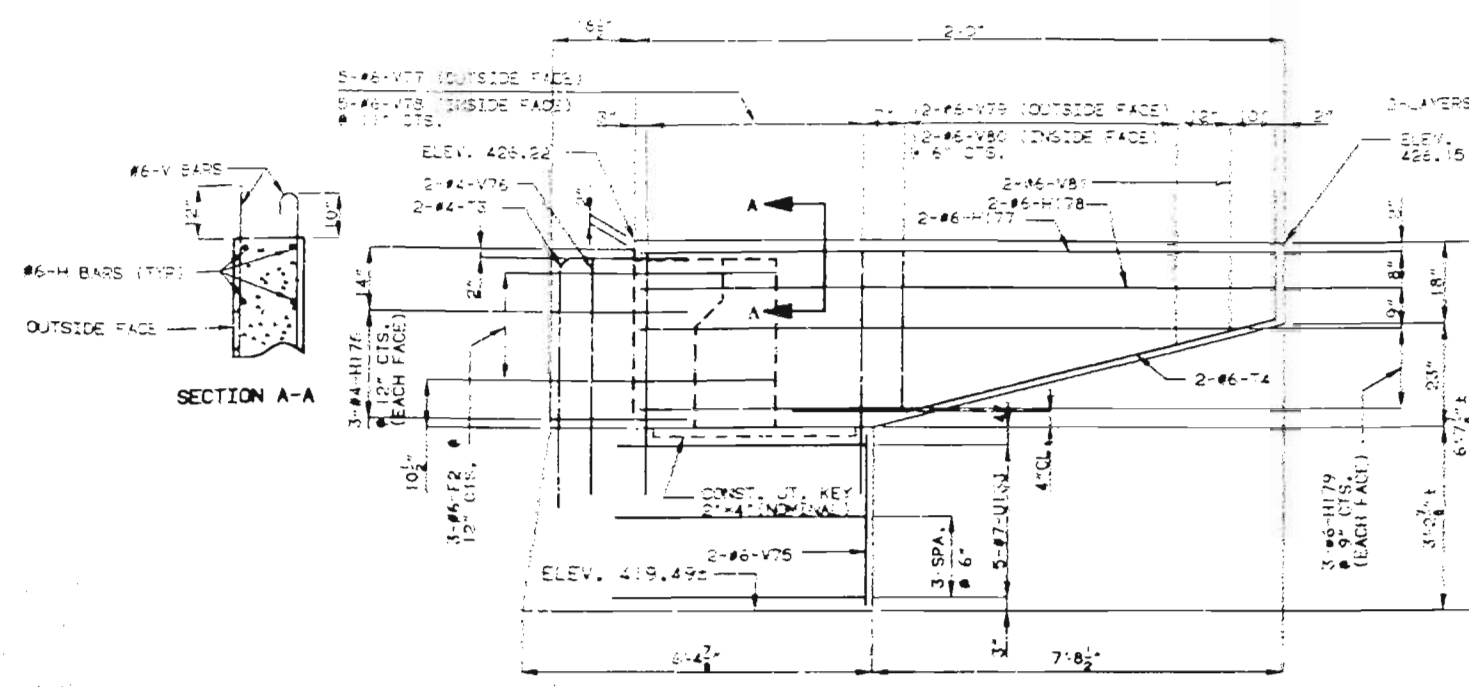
DETAILS OF END BT. NO. 1 (NORTHBOUND LANE)
